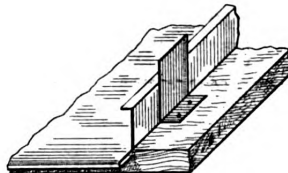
Cleat Applied to Zinc Sheet and Roof.
